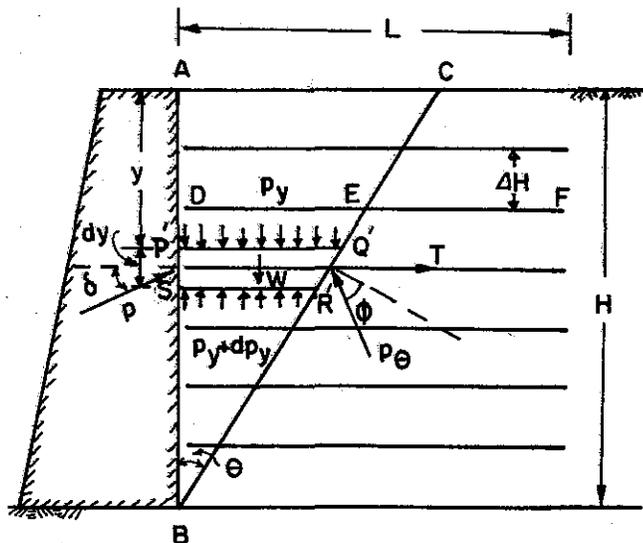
Forces acting on the element P'Q'R'S' for analysis of a reinforced backfill behind a conventional retaining wall (Saran, Talwar, and Prakash)
